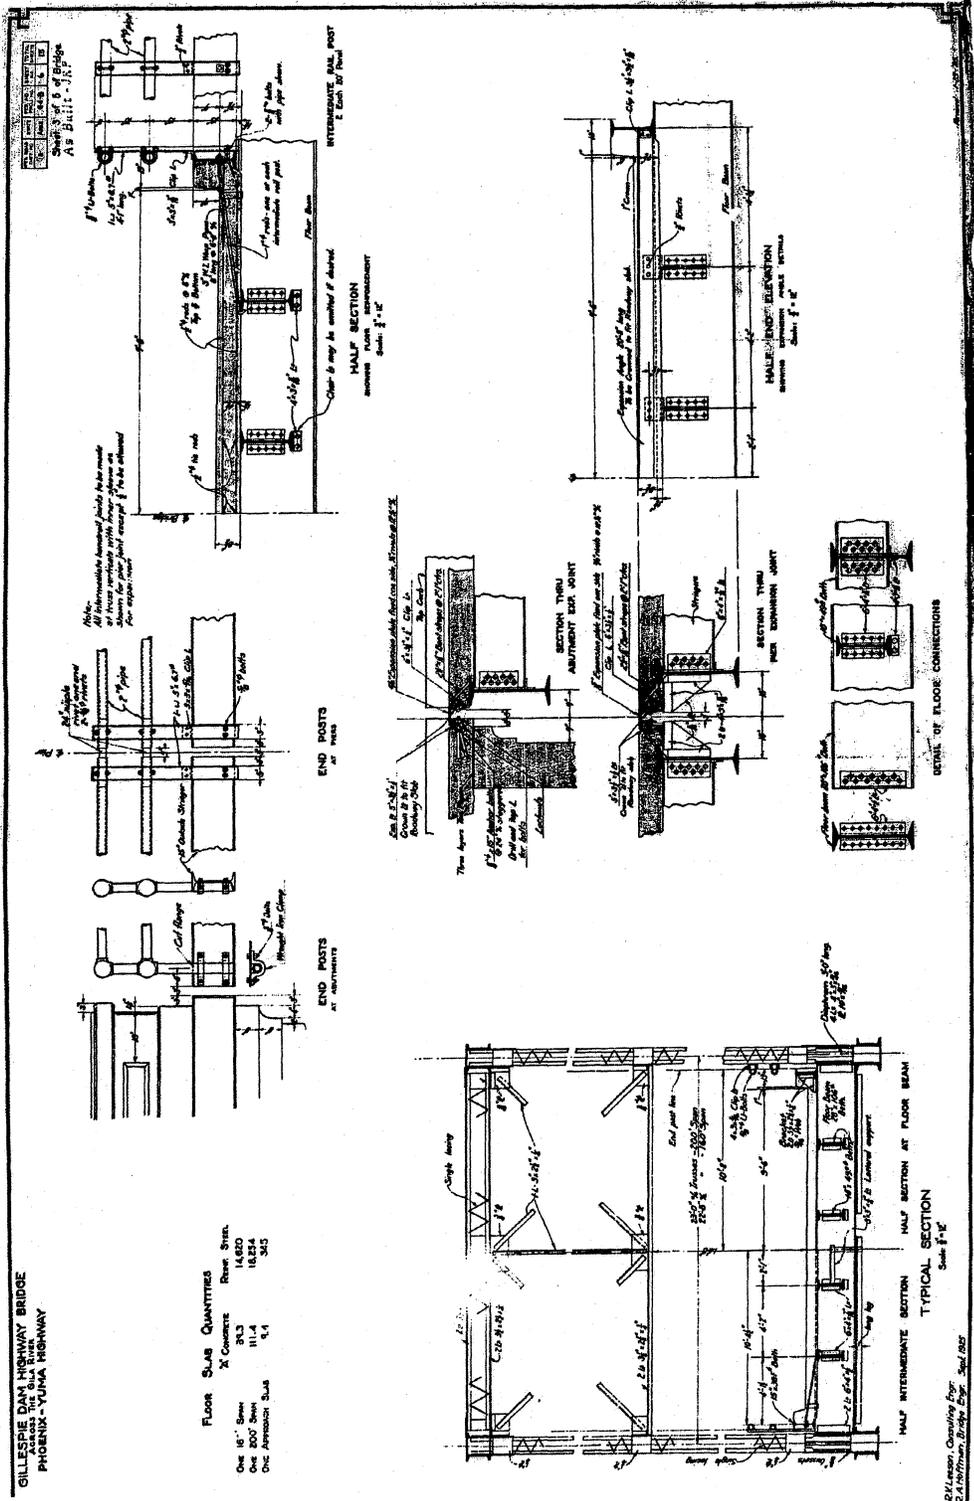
Gillespie Dam Highway Bridge Across the Gila River — Phoenix - Yuma Highway — Truss Sections, 11-23-1925
